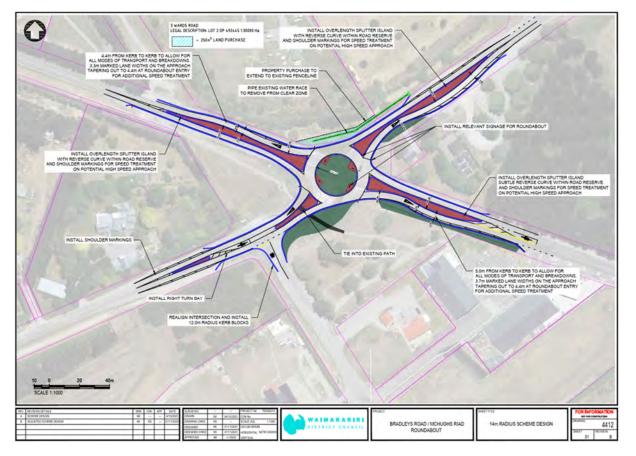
Council Proposed Tram Road / Bradleys Road / McHughes Road Roundabout
